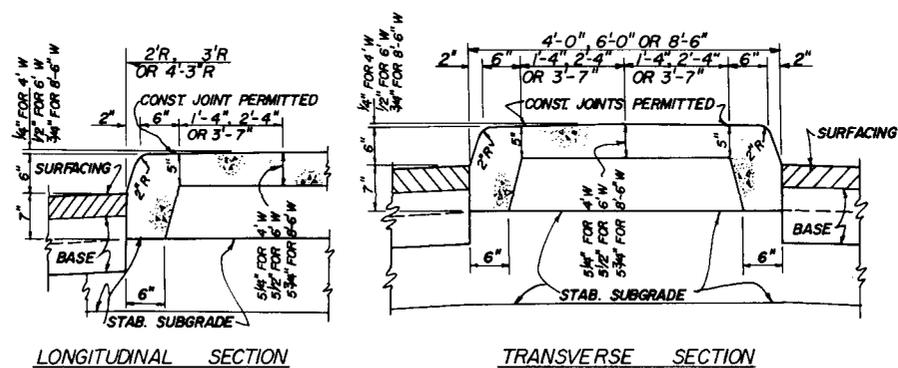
DETAILS OF TYPE I CONCRETE TRAFFIC SEPARATOR
